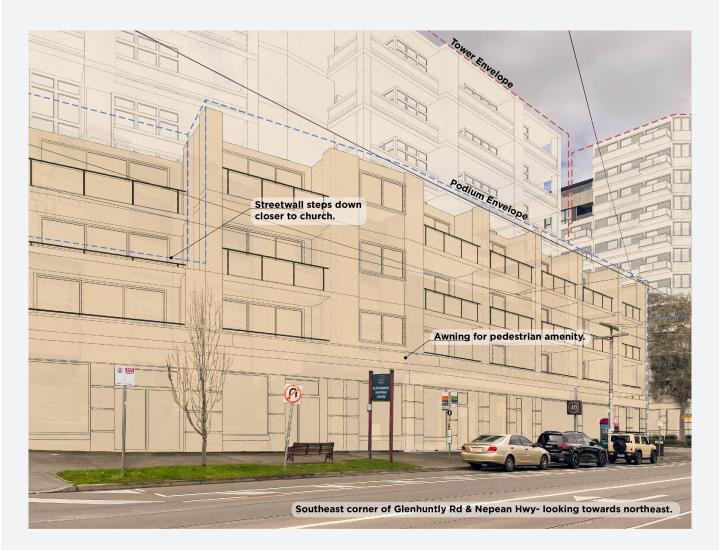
Illustration of maximum building envelopes in the Urban Renewal Precinct where a 12-storey height limit is proposed (for conceptual purposes only).
